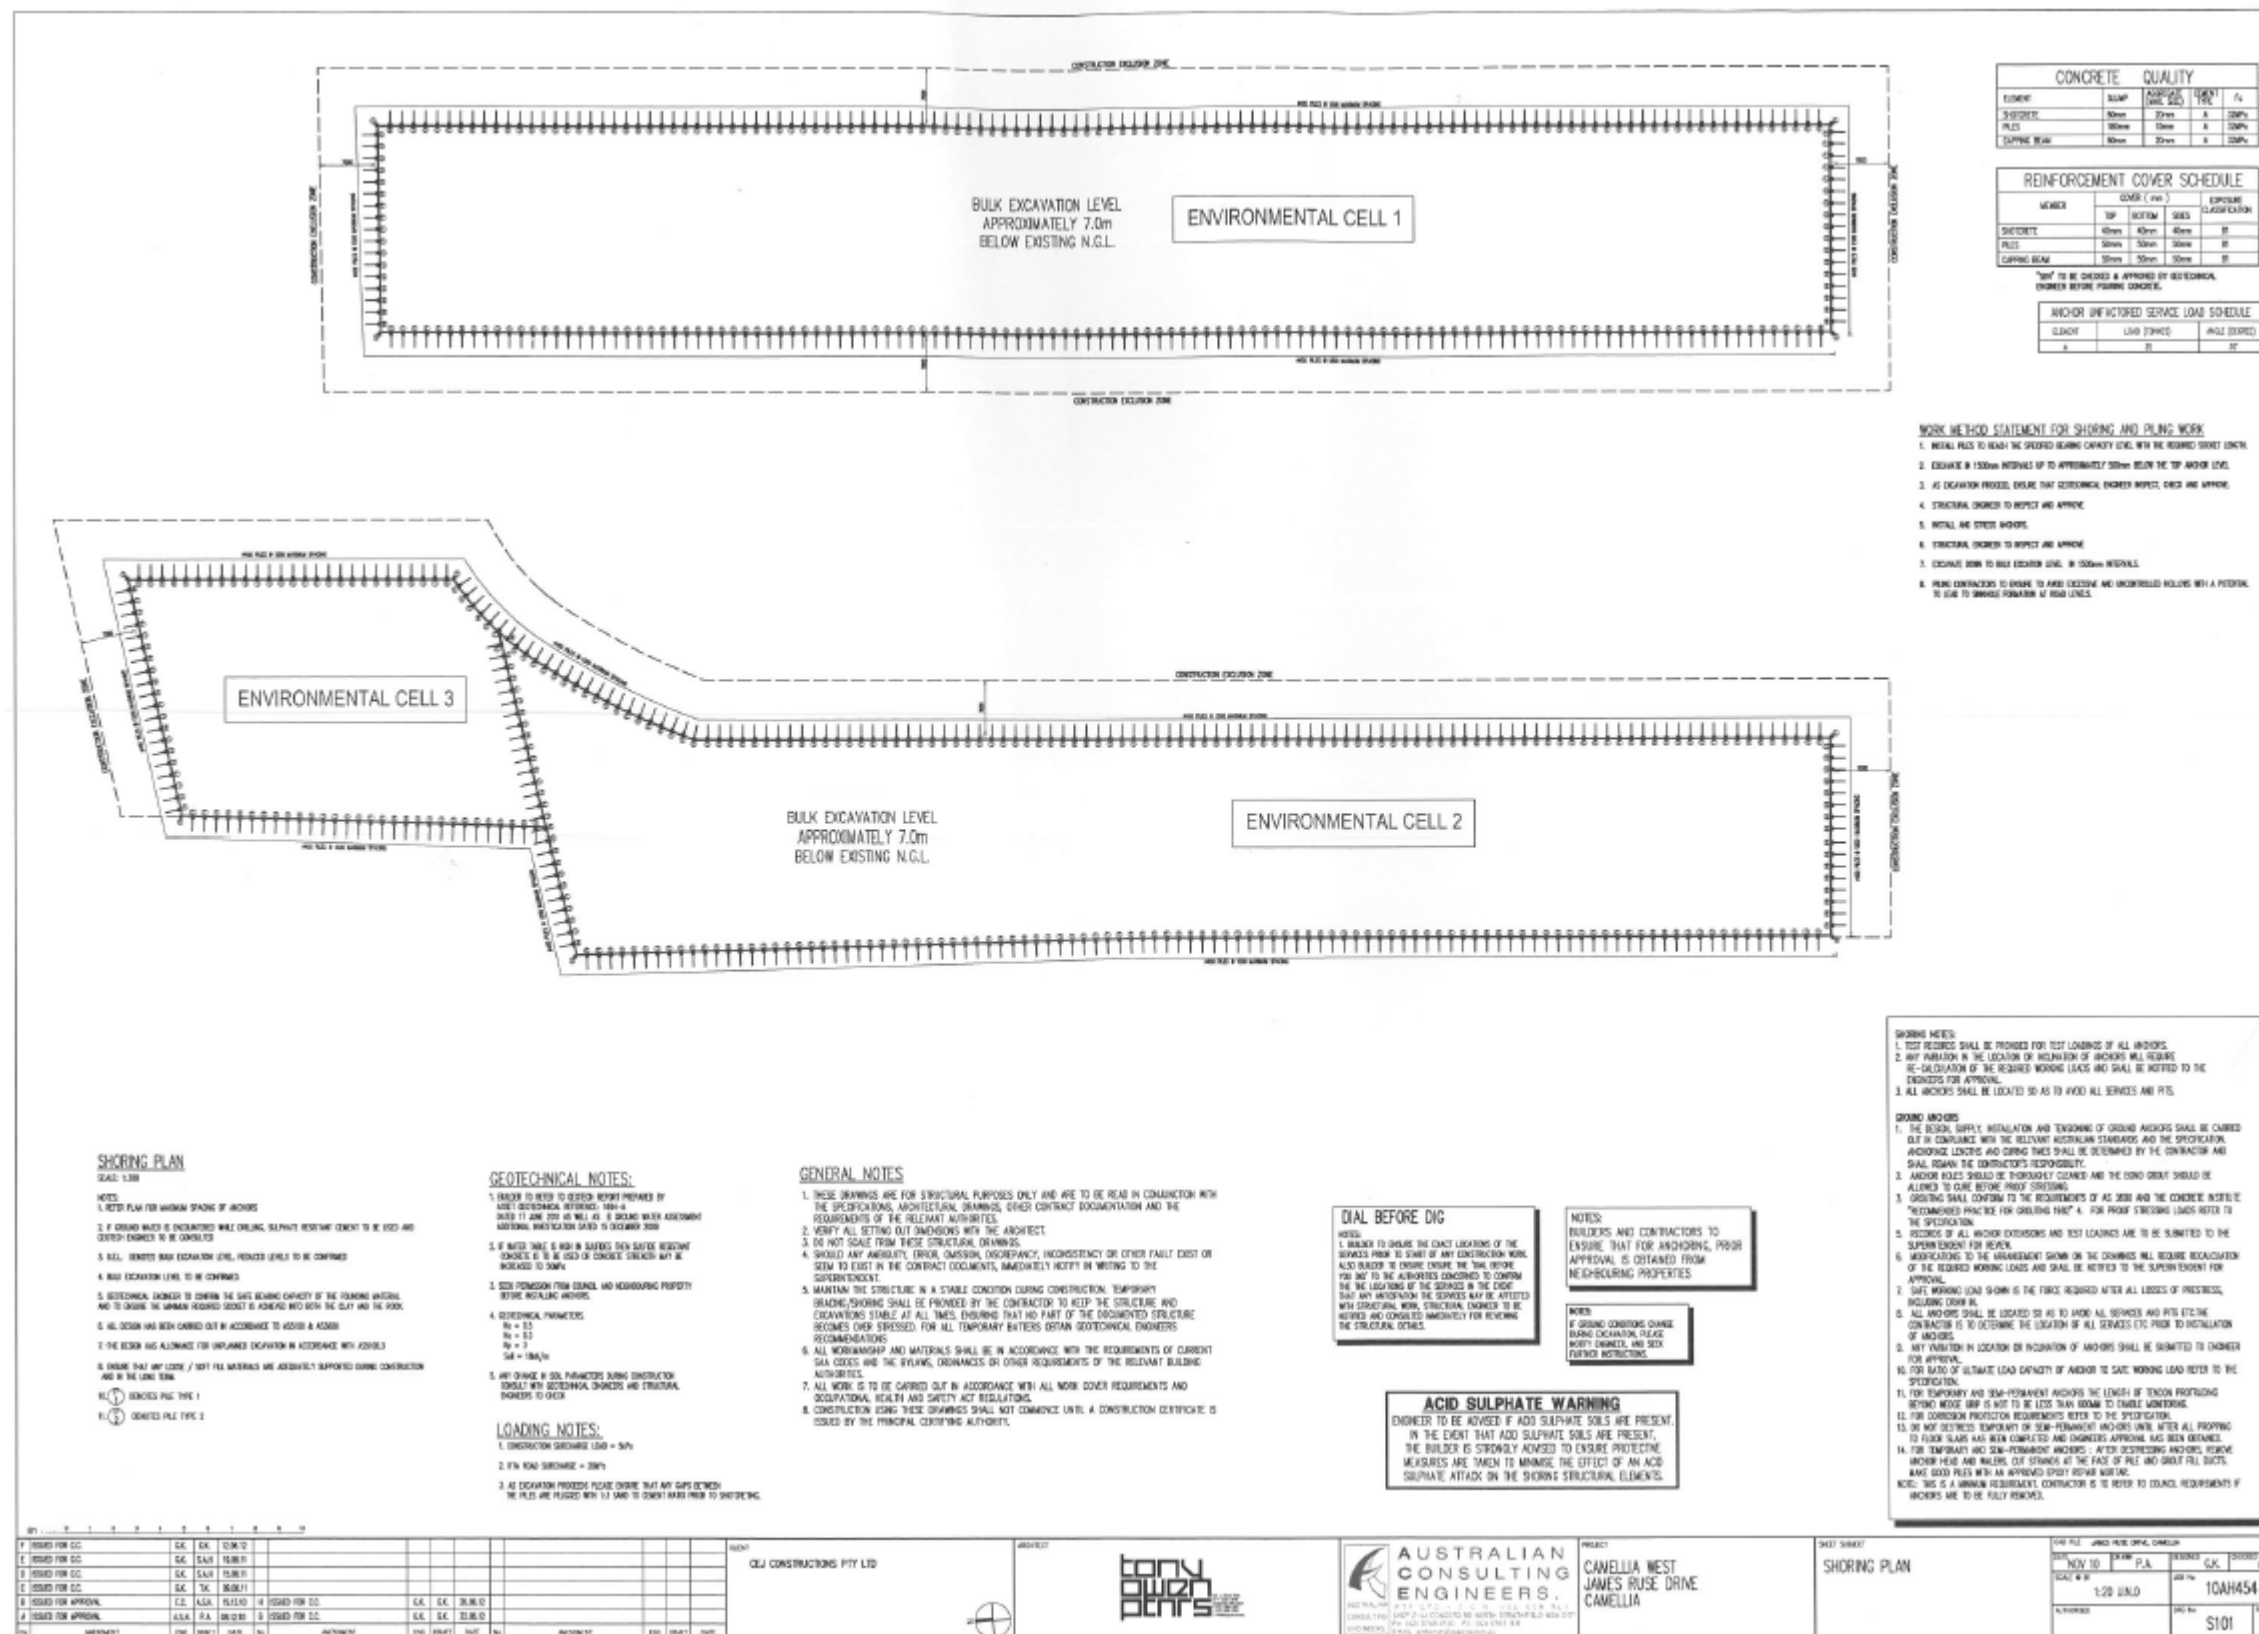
Camellia West, James Ruse Drive Camellia – Shoring Plan S102
